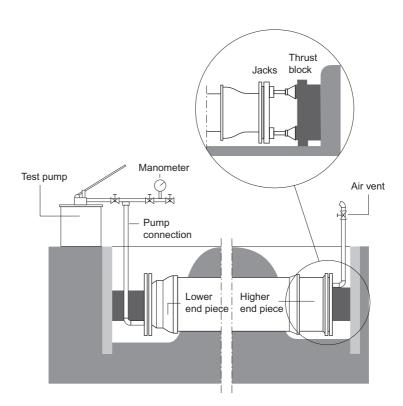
Pipe testing equipment (Pont-a-Mousson, 1992).
